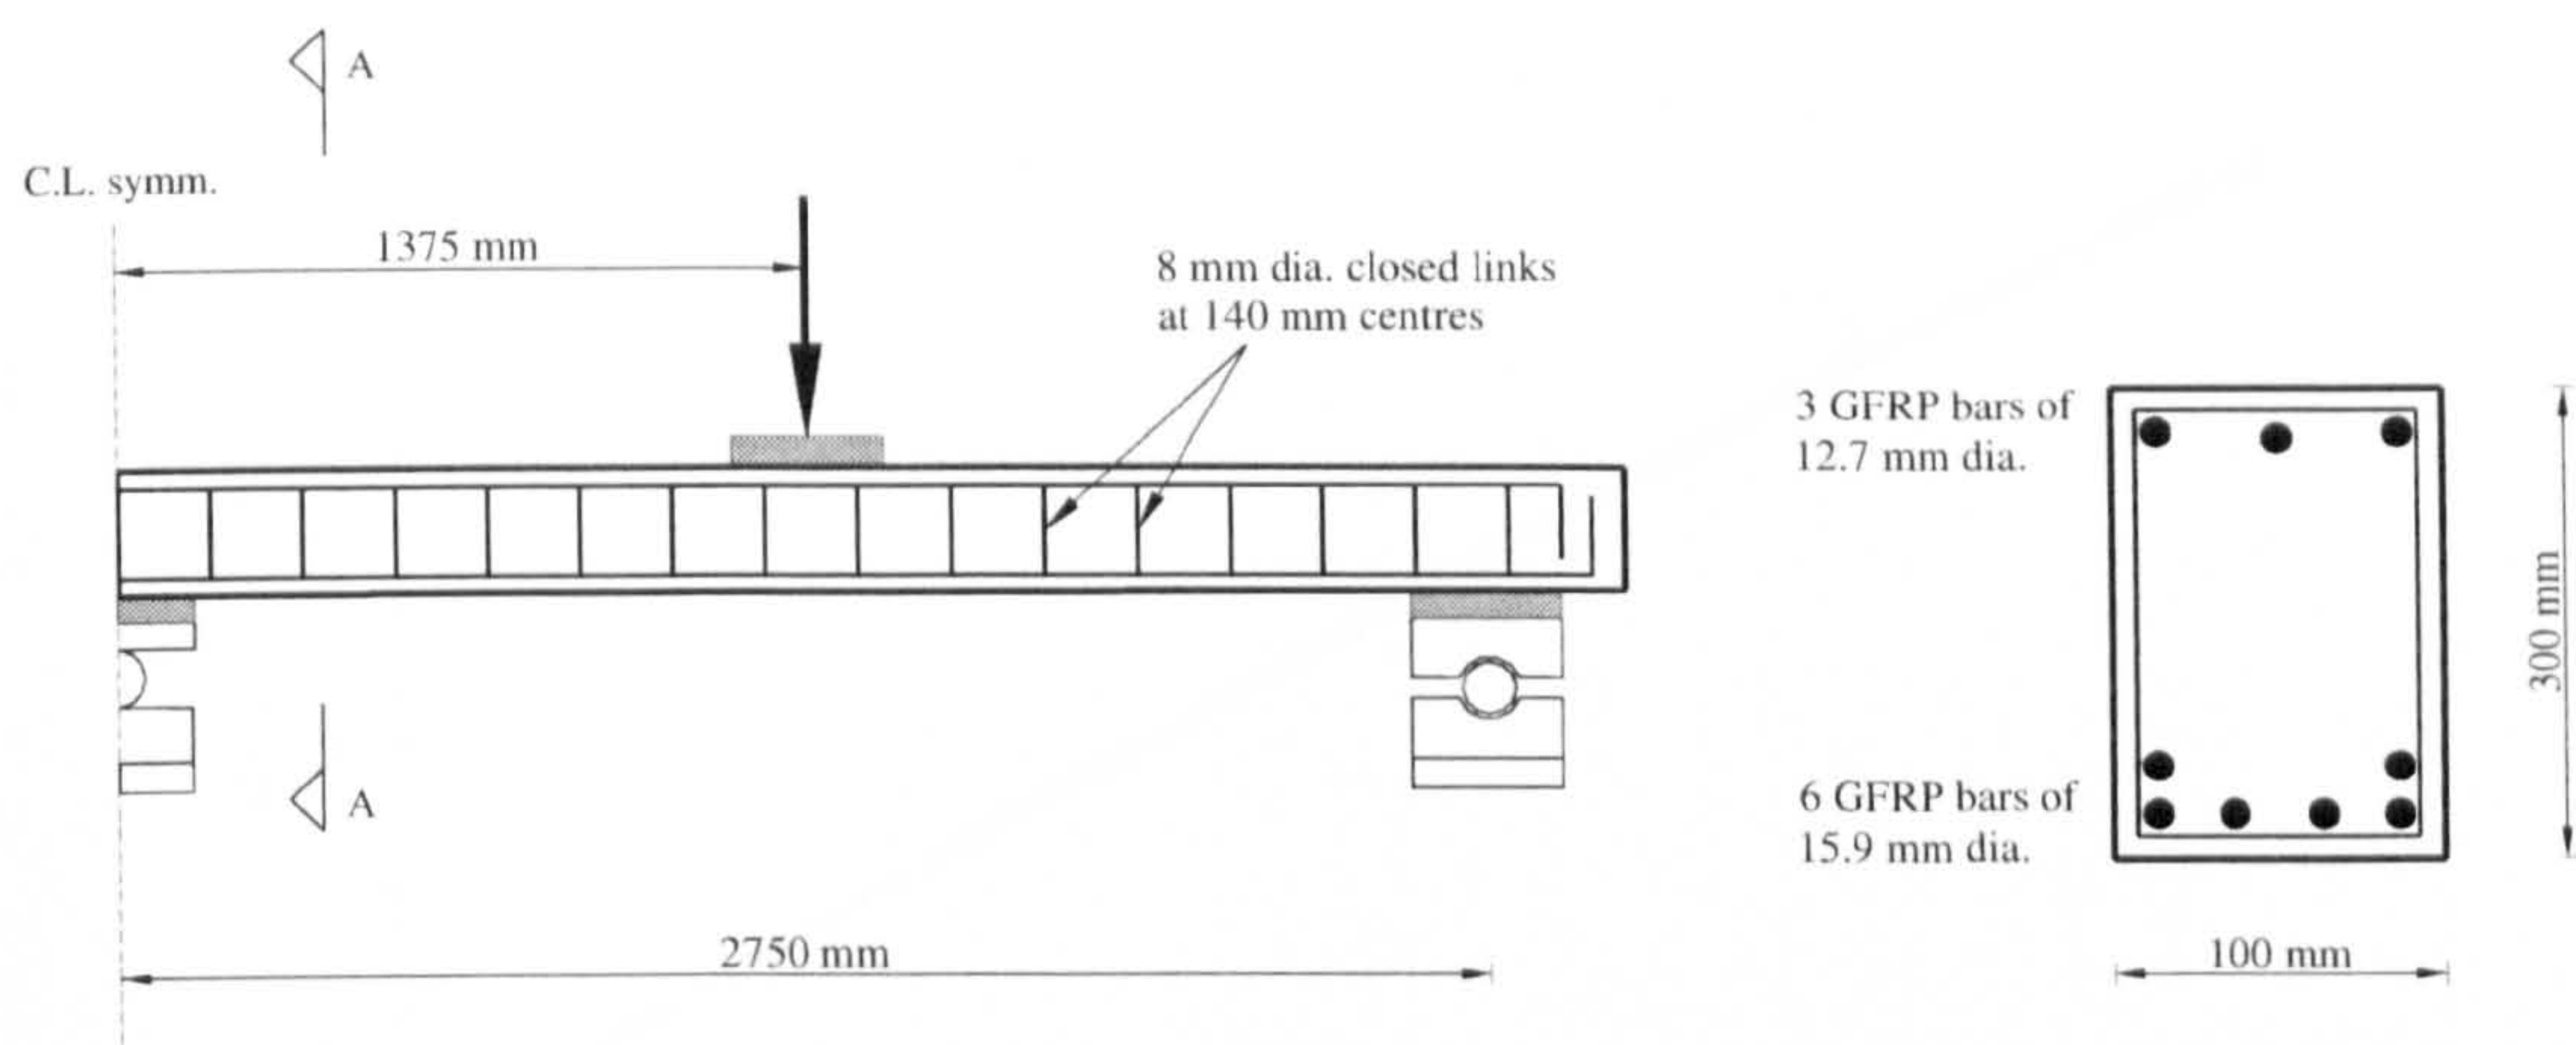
Test details (GoUC in Habeeb and Ashour 2008)
